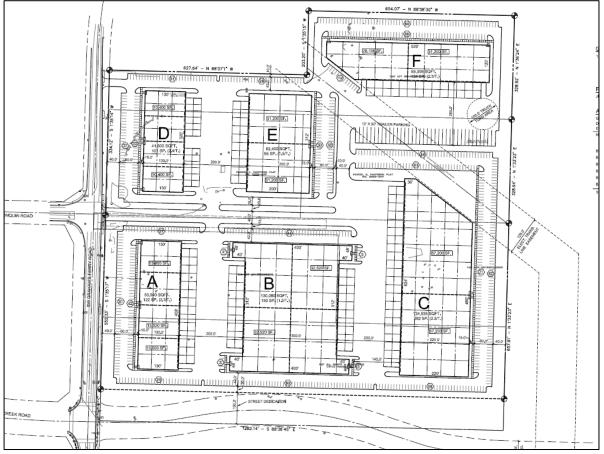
SUBJECT SITE EASTERN SECTION, PRELIMINARY SITE PLAN (SUBJECT TO CHANGE)
